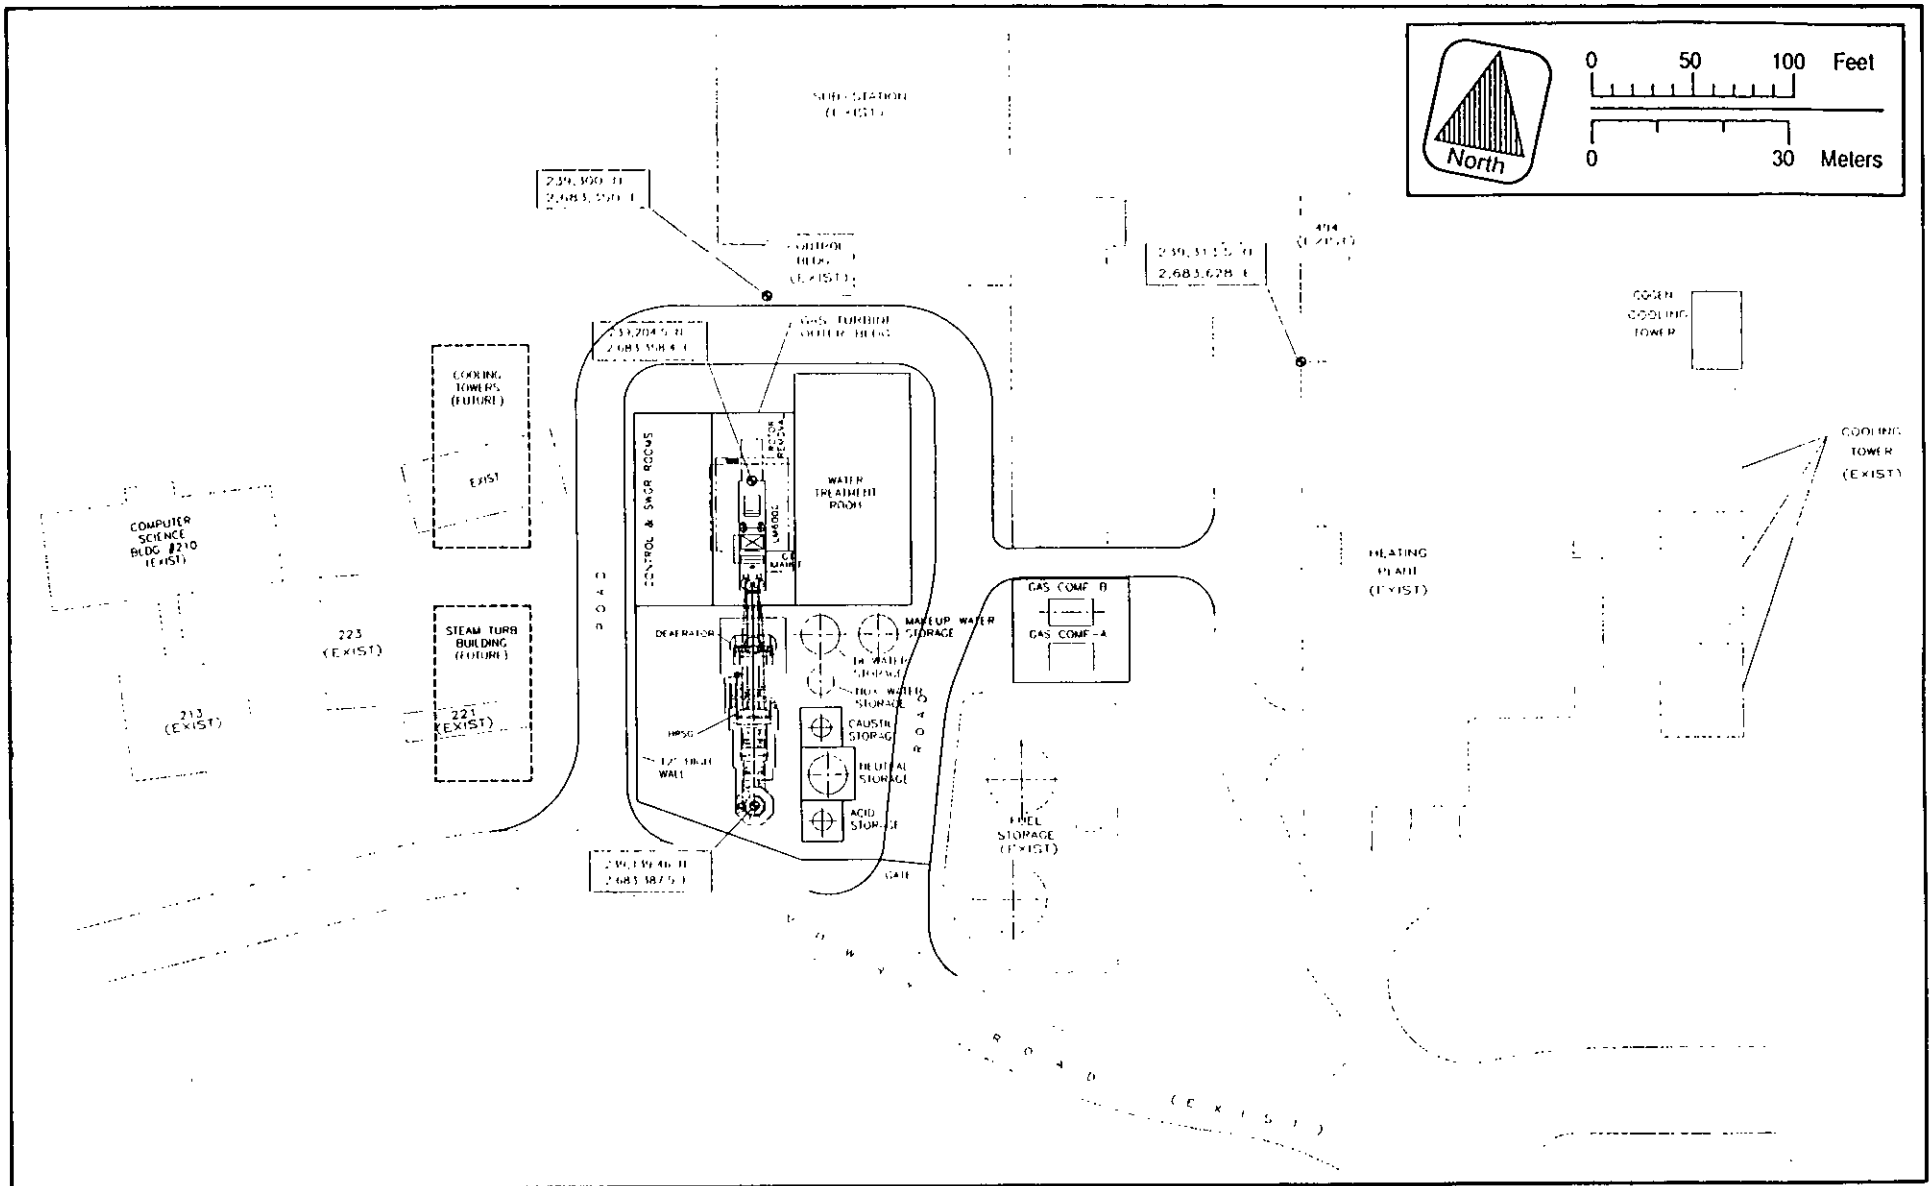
PLOT PLAN FOR UF COGENERATION FACILITY
